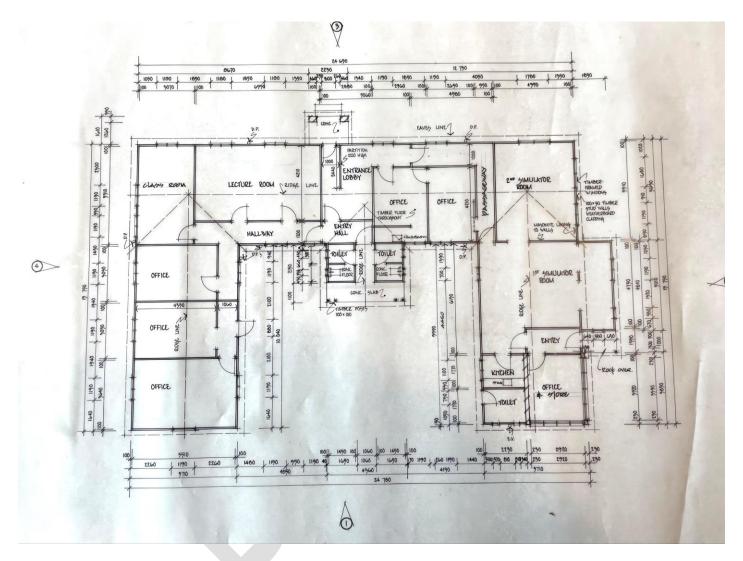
Floorplan of existing former RAAF Headquarters building (Source: provided by Aeria Management Group)
